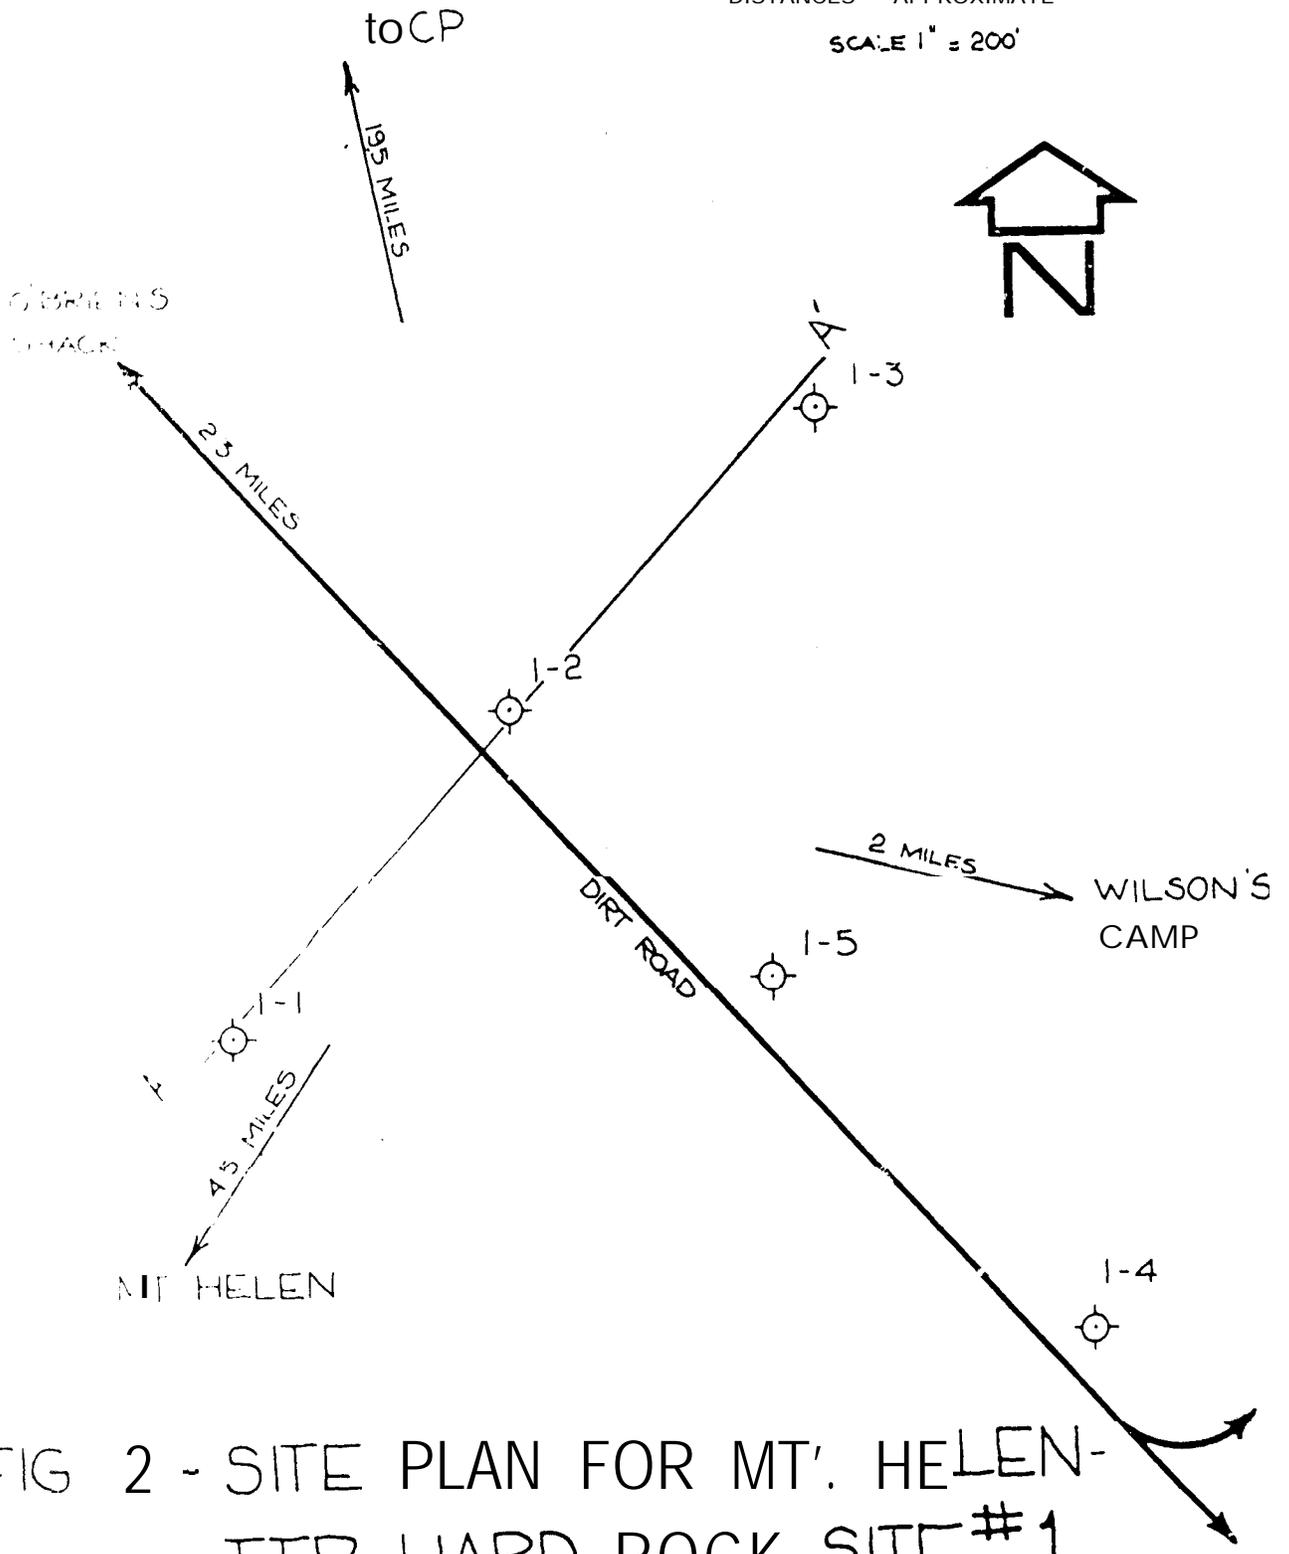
SITE PLAN FOR MT. HELEN-TTR HARD ROCK SITE #1
